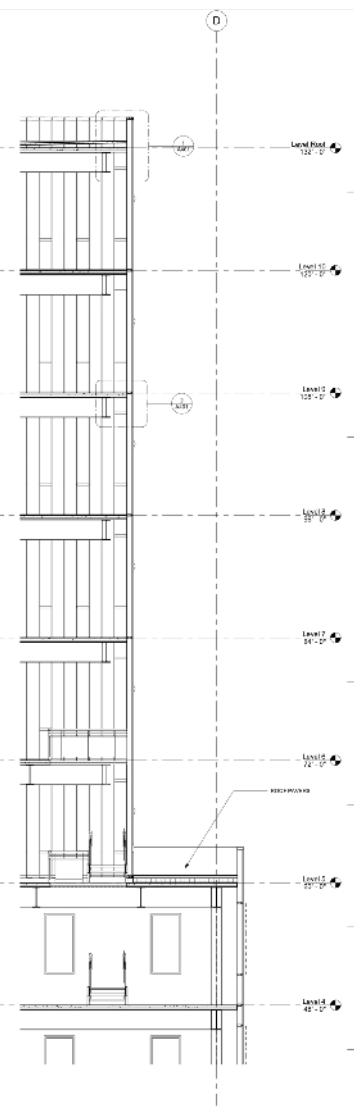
DETAIL SECTION - CURTAINWALL AT PAPAPET
